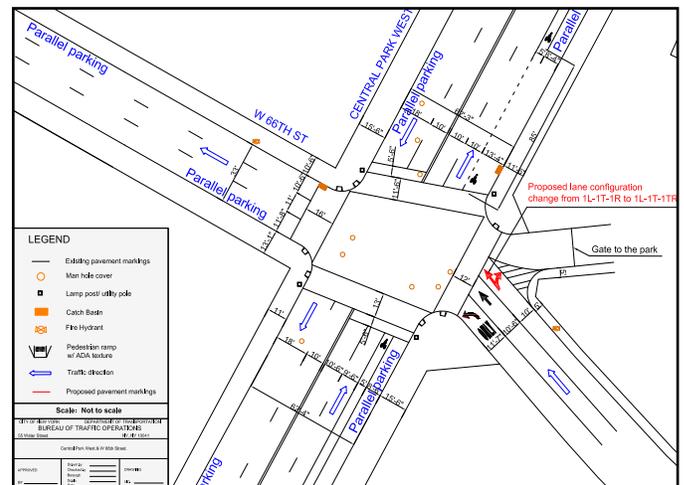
Proposed Lane Assignment - Central Park West & West 66th Street
